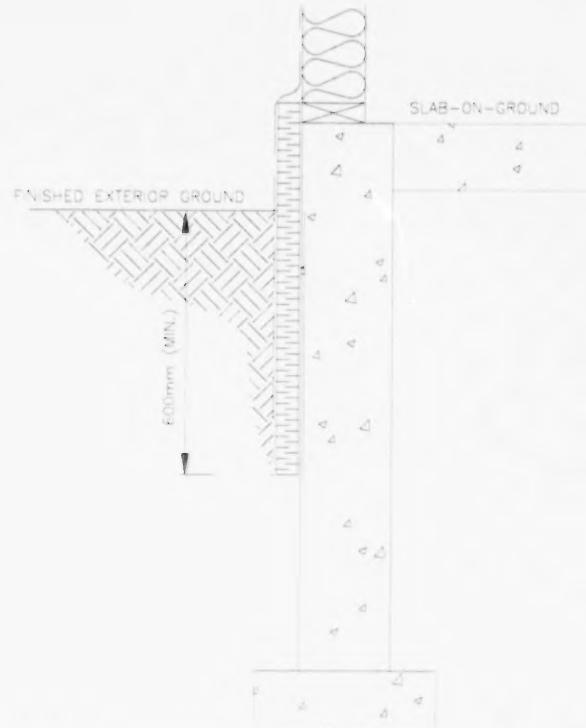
Thermal Insulation Installed Vertically for Slab-on-Ground
